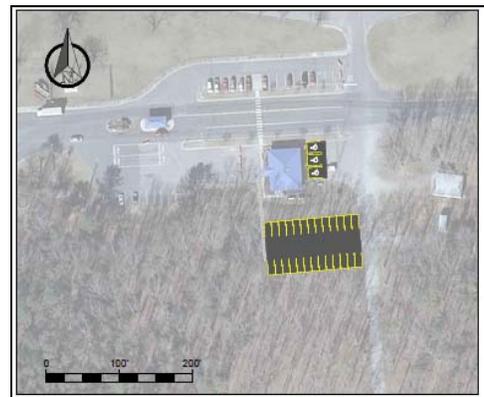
Alternative One, phase I- proposed employee parking lot
